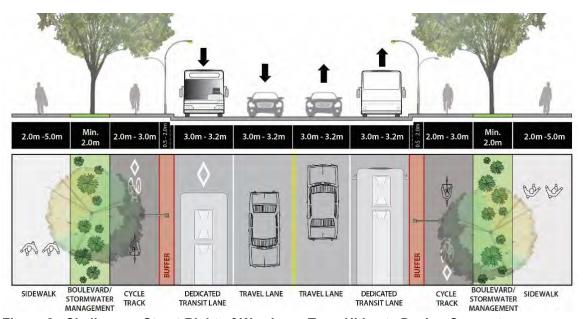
Shelbourne Street Right-of-Way Long-Term Ultimate Design Concept
